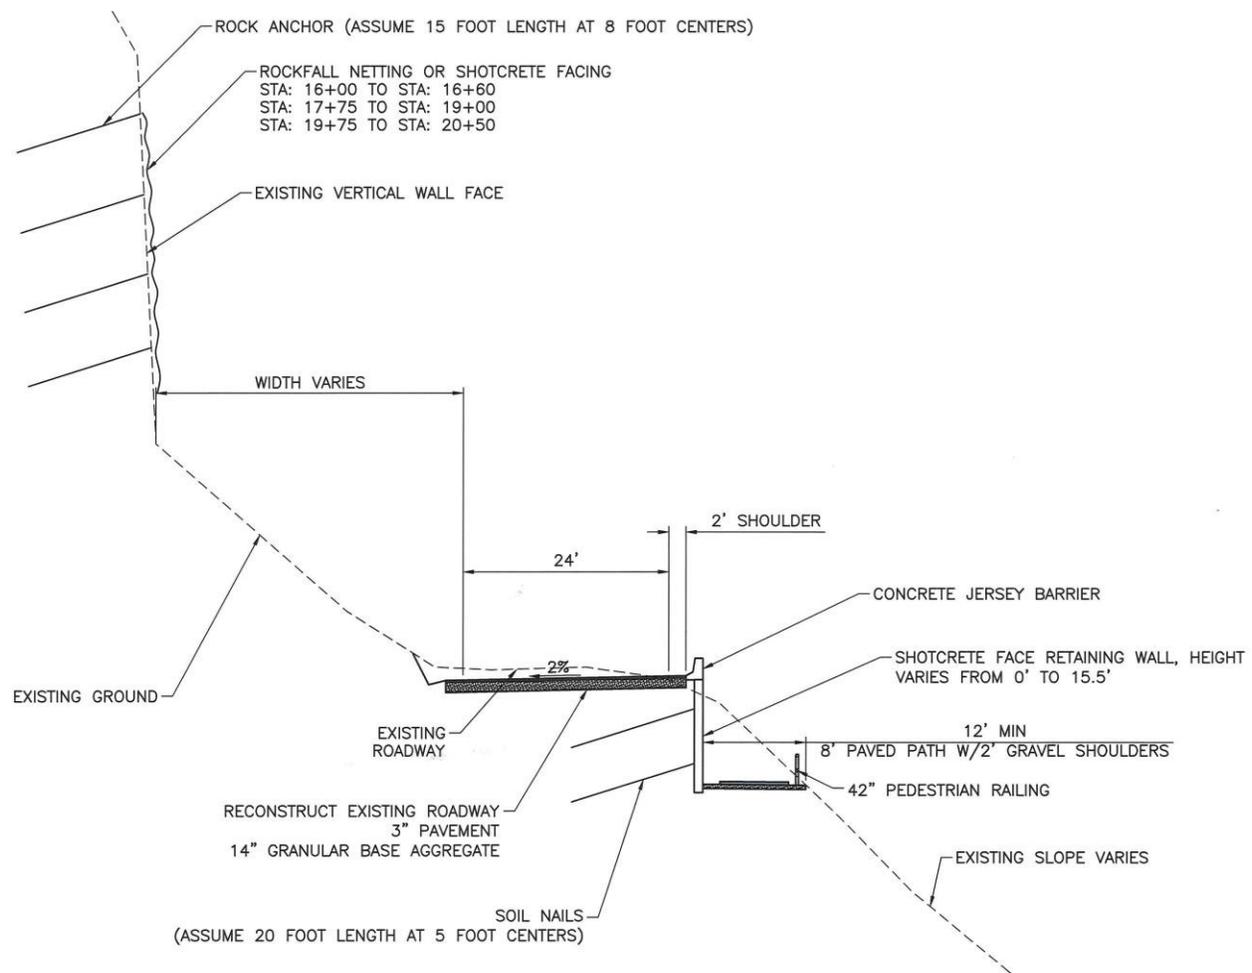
TYPICAL SECTION – ALTERNATIVE 2 - LOWER ROADWAY SECTION – BELOW UPPER HAIRPIN CURVE
